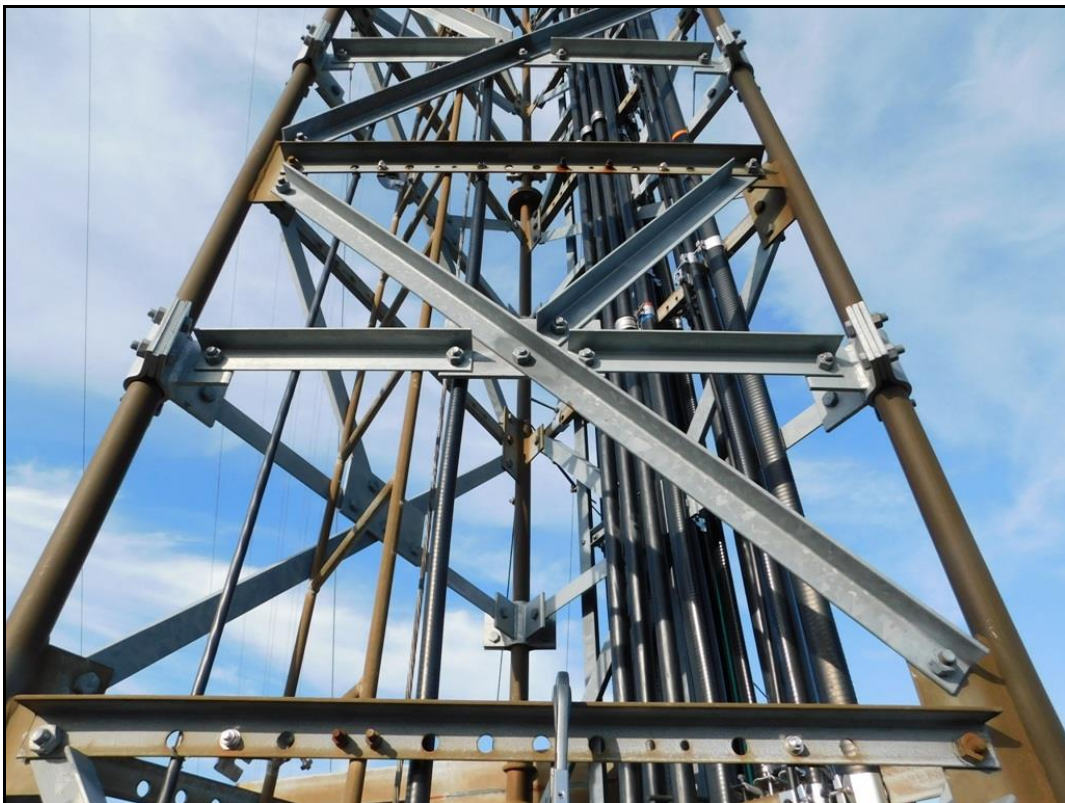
New horizontal and diagonal sub-bracing installed on the tower
